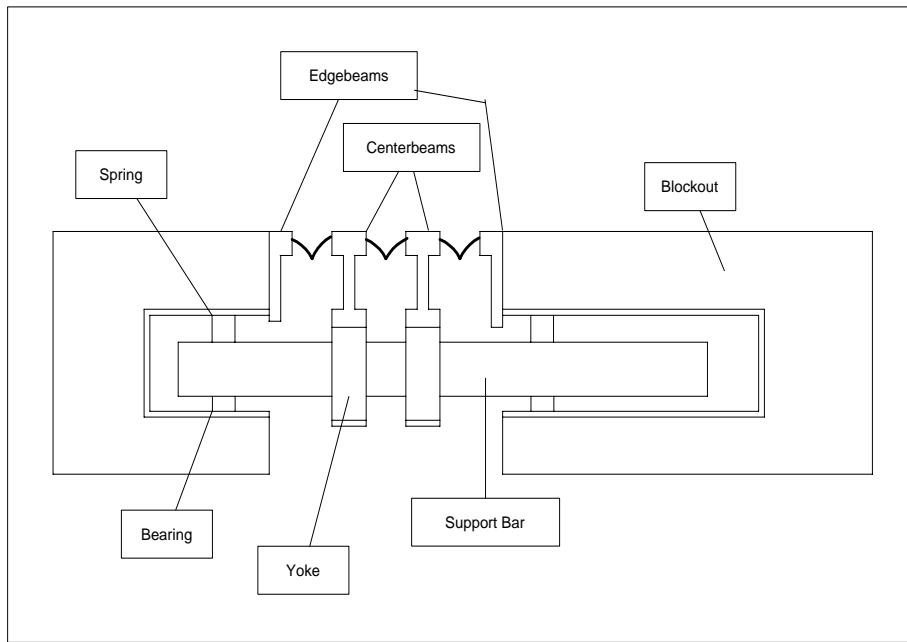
Cross-Section View of Typical Single-Support-Bar (SSB) Modular Bridge Joint System (MBJS) Showing Multiple Centerbeams with Yokes Sliding on a Single Support Bar.
